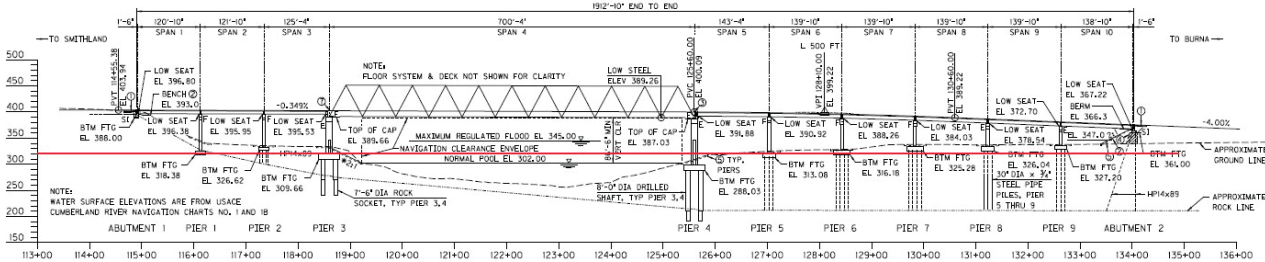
Bridge Profile Showing Water Surface Elevation EL. 320.0
